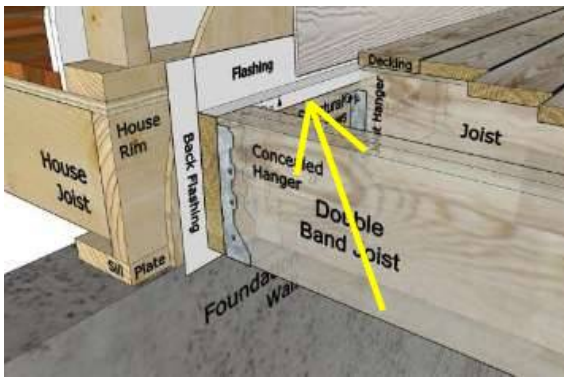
The flashing highlighted here is not seen over the deck's ledger board. A few examples are shown in the next photos.
